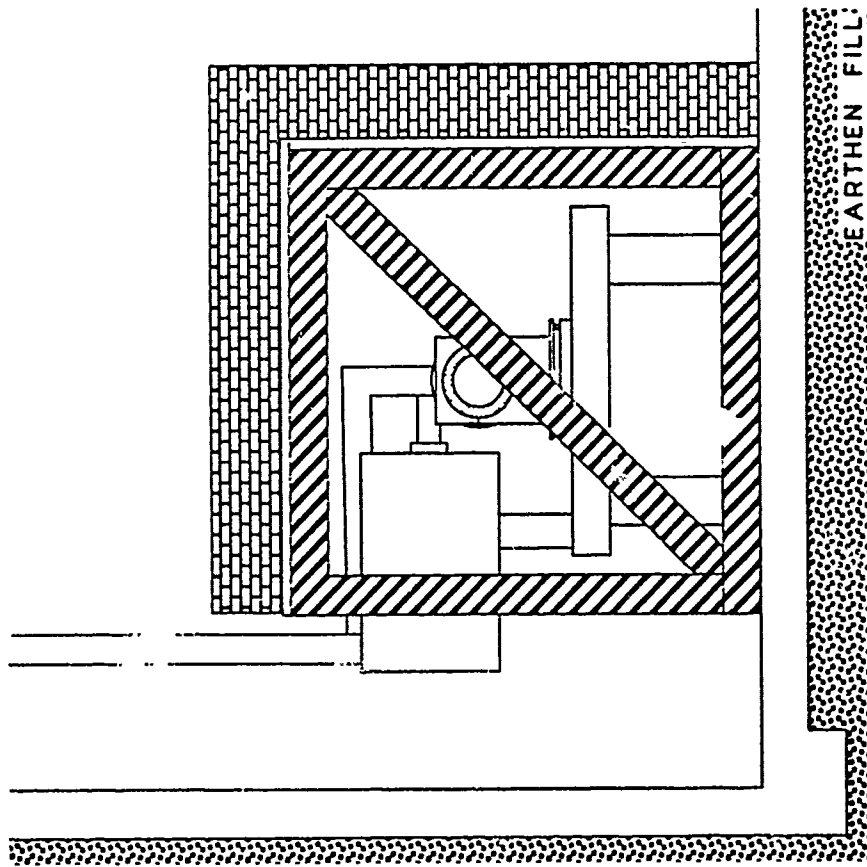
Elevation of accelerator room showing the view facing north. Notice the 2 feet gap in the roof of the concrete bunker.
